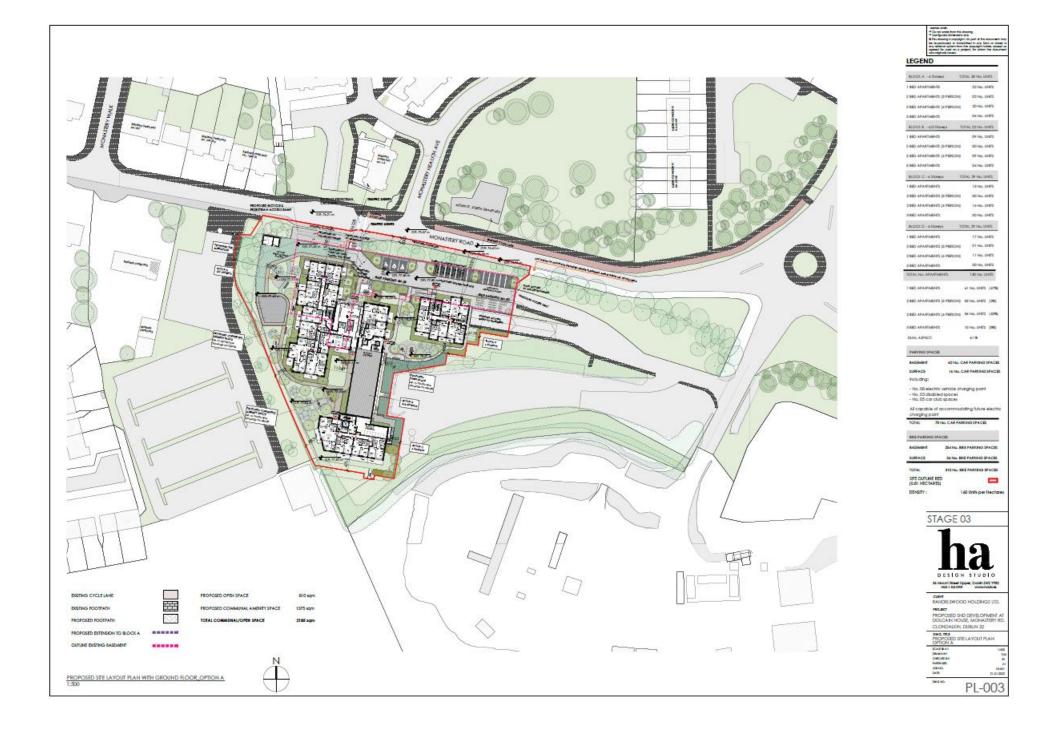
Proposed site layout plan – Option A (incl. footpath)
